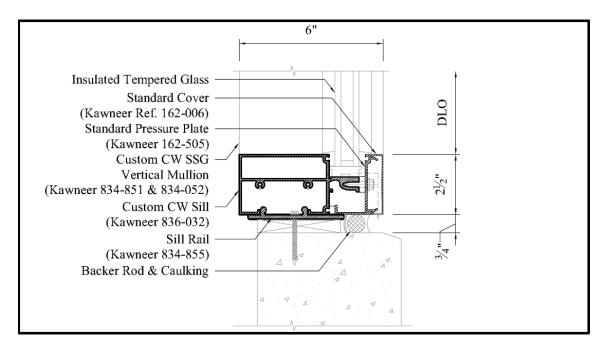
Typical custom-made sill mullion detail, curtain wall system on floors 1st to 12th. Adapted from Diaz, O. (2014).
